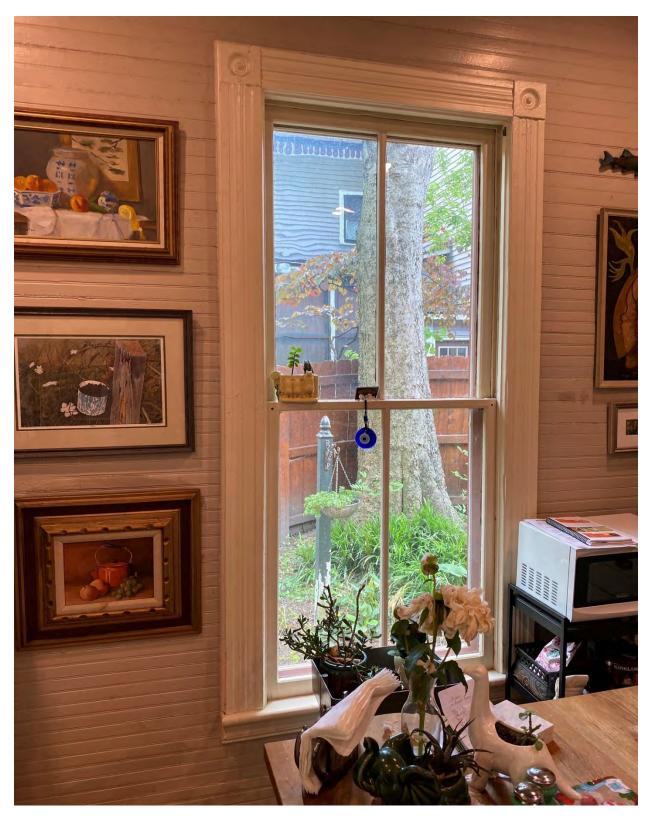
924 Carr St 1990's replacement window to be installed here
